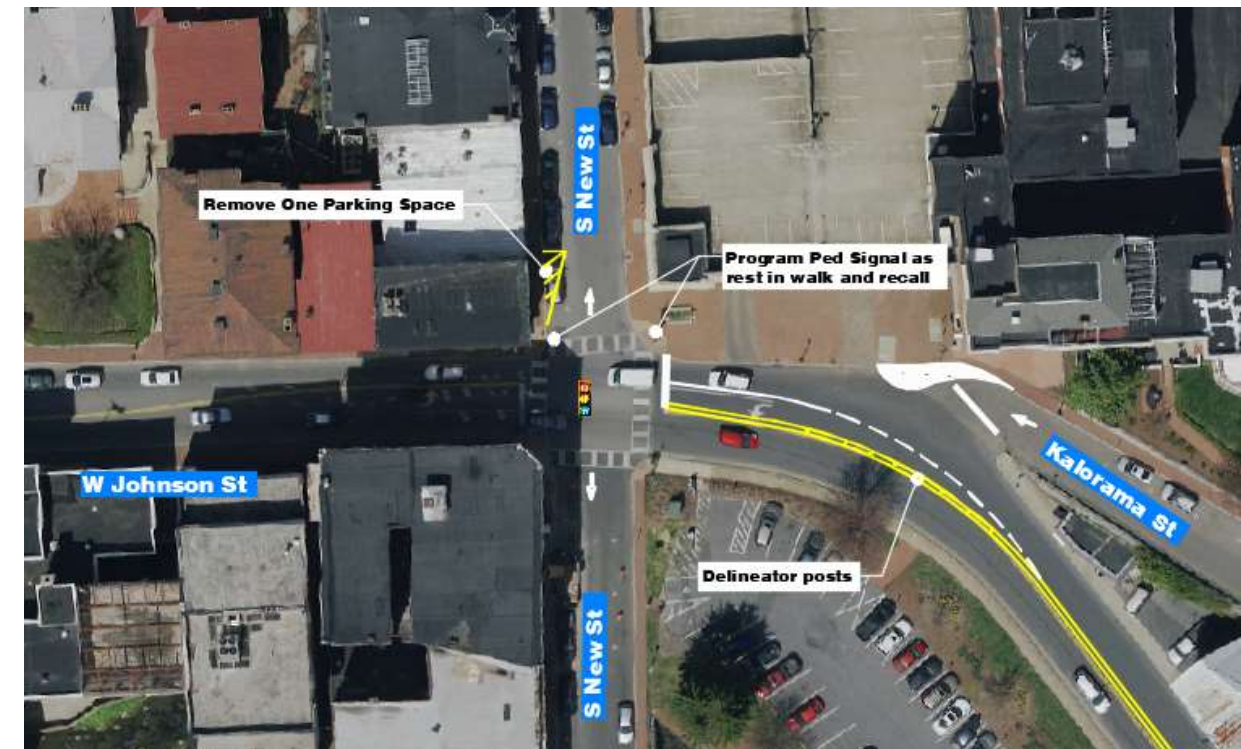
Alternative 1 Concept Sketch - West Johnson Street at South New Street
